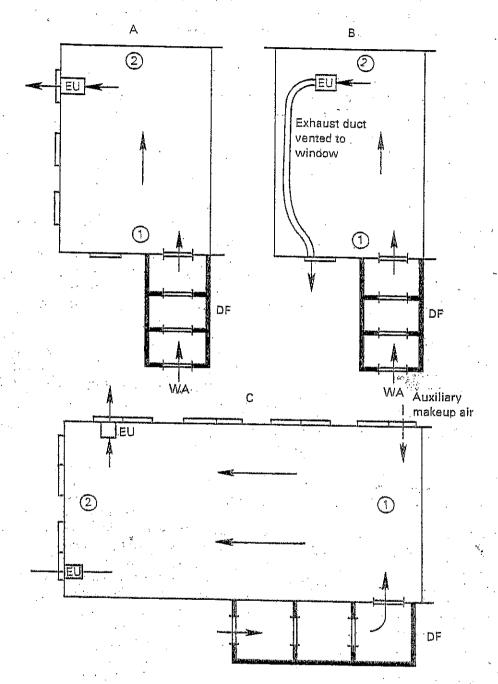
Examples of negative pressure systems. DF, Decontamination Facility, EU, Exhaust Unit; WA, Worker Access; A, Single-room work area with multiple windows; B, Single-room work area with single window near entrance; C, Large single-room work area with windows and auxiliary makeup air source (dotted arrow). Arrows denote direction of air flow. Circled numbers indicate progression of removal sequence.
